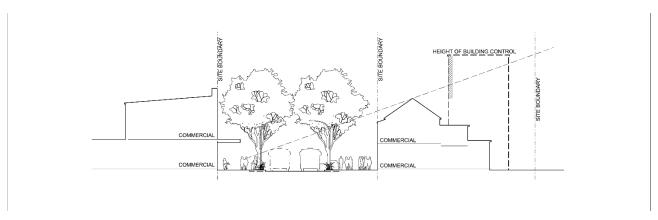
Street Cross Section - Regent Street Additions (Pitched roofs)
